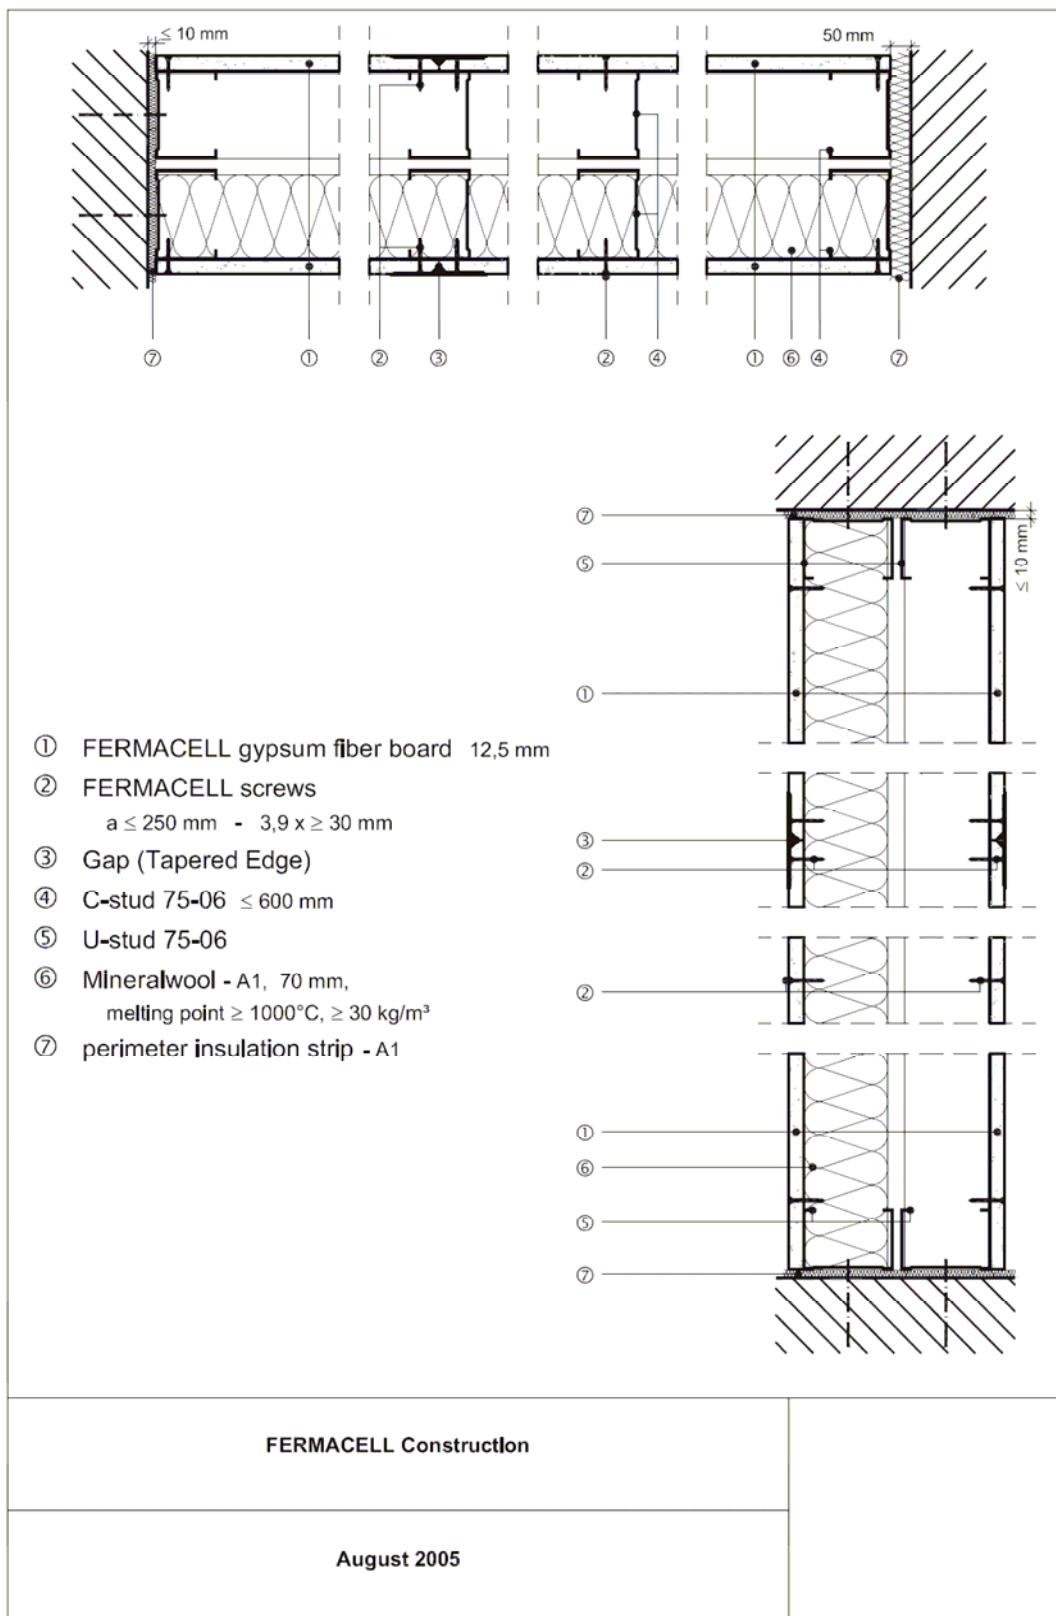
Cross-section overview of the 1S24 wall construction with 1 layer of mineral wool.
